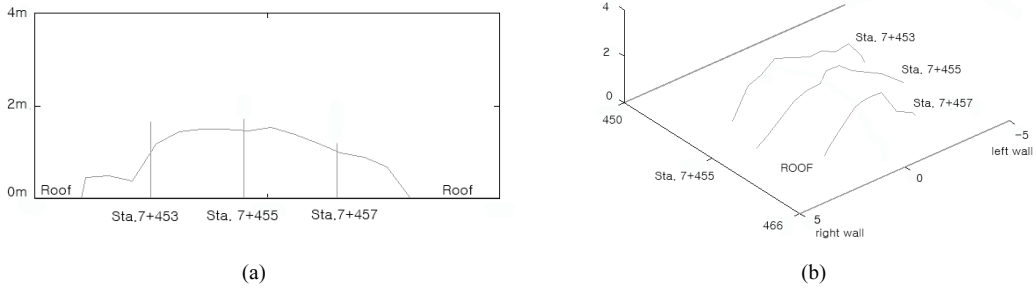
Profiles of collapsed block (a) longitudinal section, (b) transverse section
